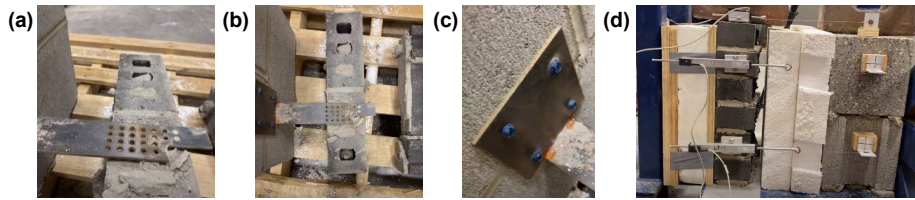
C-PH.CN-1 after testing of (a) side view, (b) top view, (c) CMU connector interface, (d) specimen view during testing
